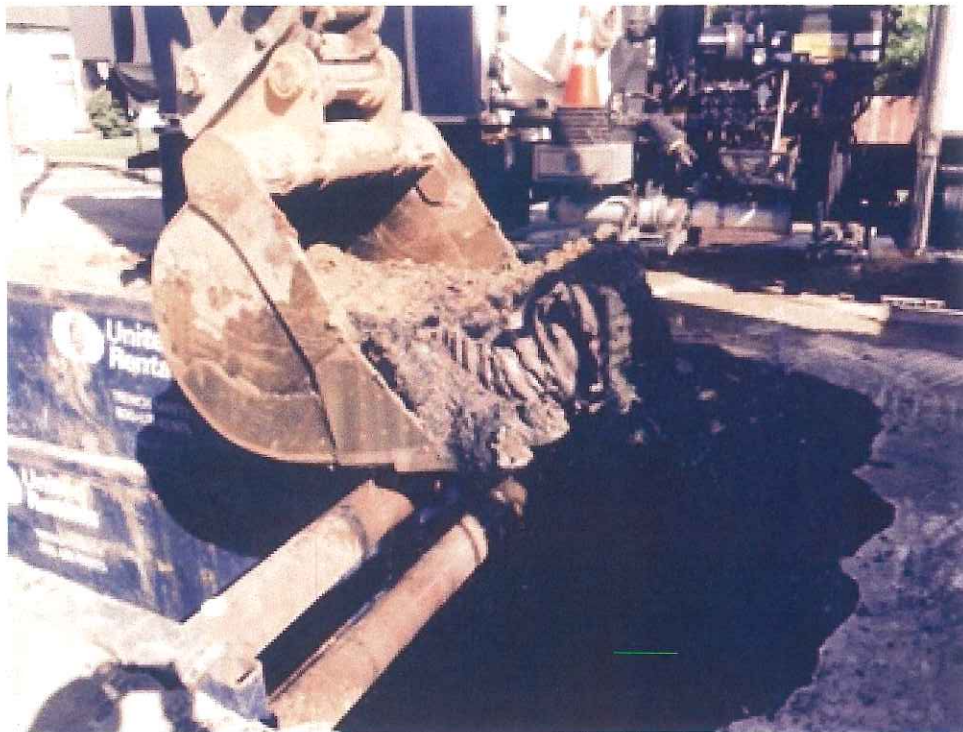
Photo showing a portion of the collapsed corrugated metal pipe
